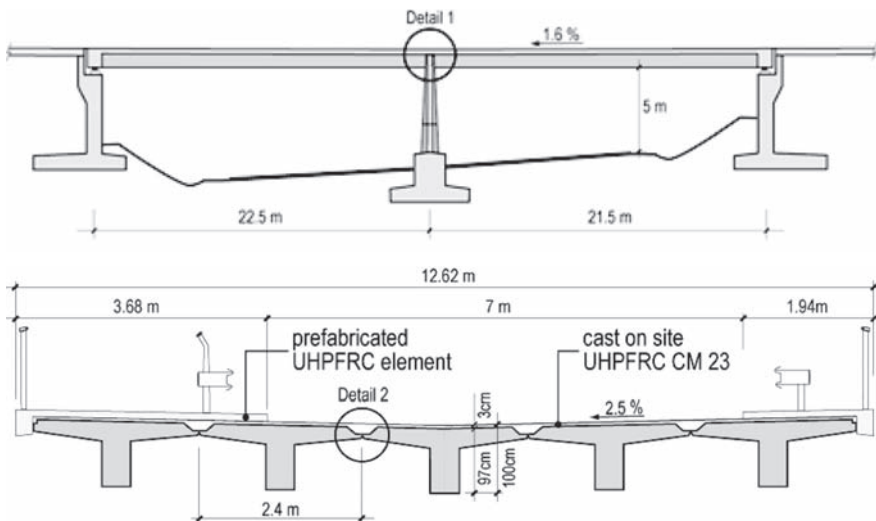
Project for a new overpass road bridge: elevation and typical cross section.
